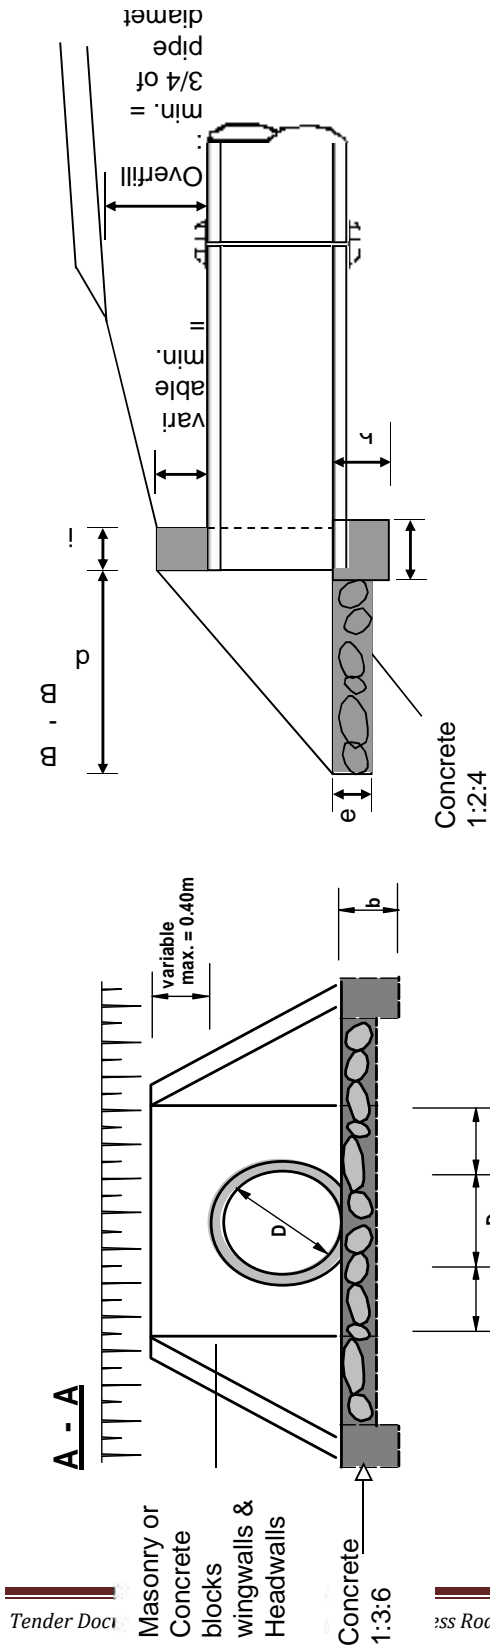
HEADWALL TYPE 1 (HEAD AND WINGWALLS)
